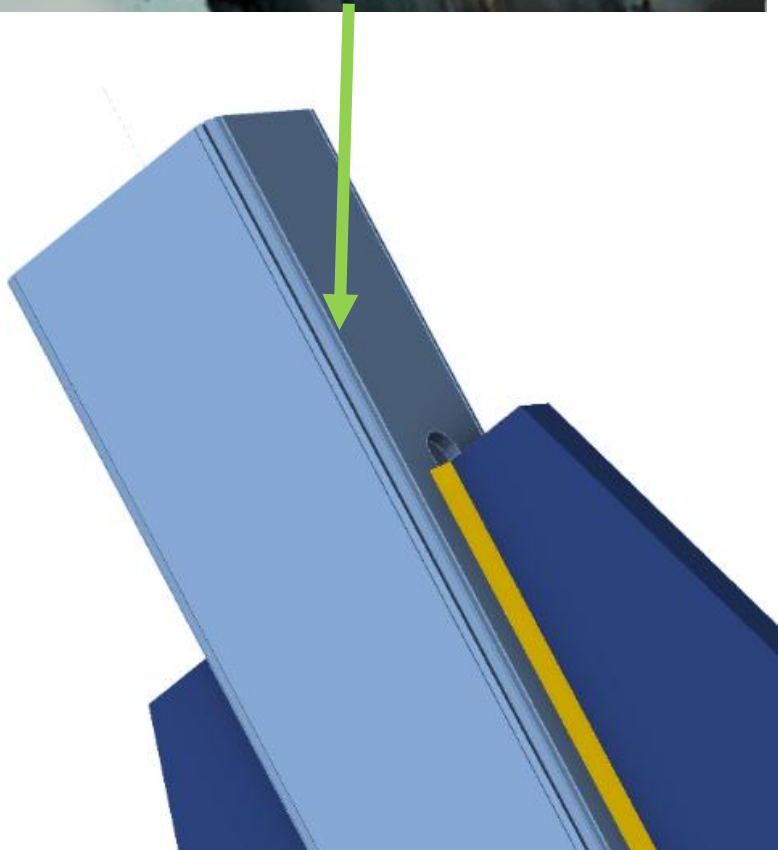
Slotted Holes in HSS brace member to engage gusset plate (AISC 360, 2016)
